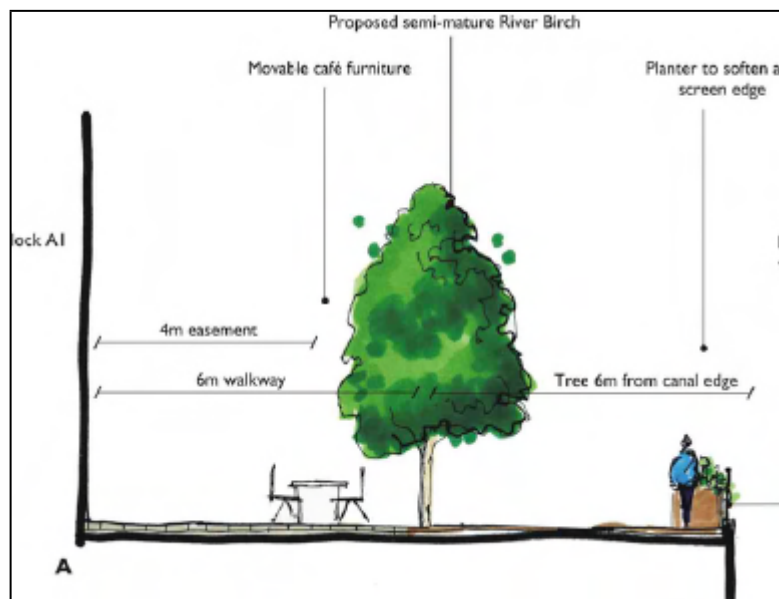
Section A-A1 - Ligurian Walk – Canal side section
